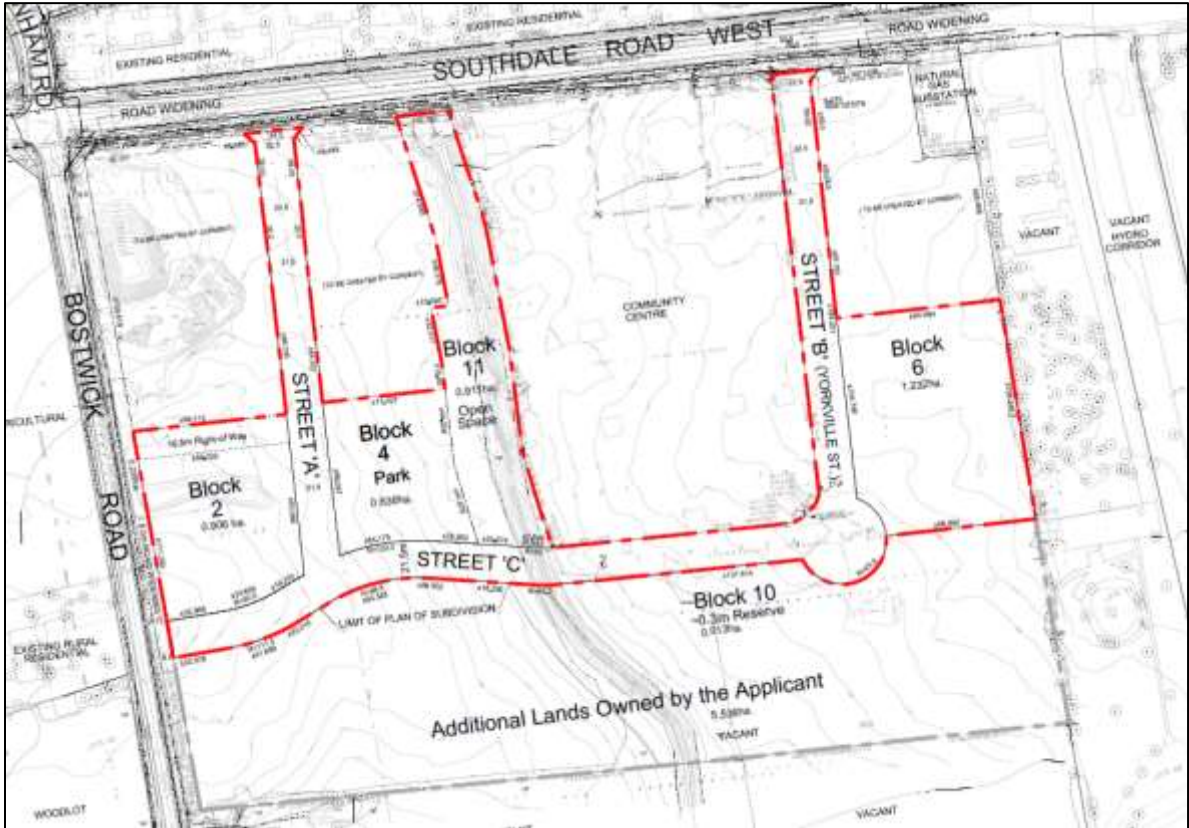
Proposed Draft Plan of Subdivision 39T-18502
